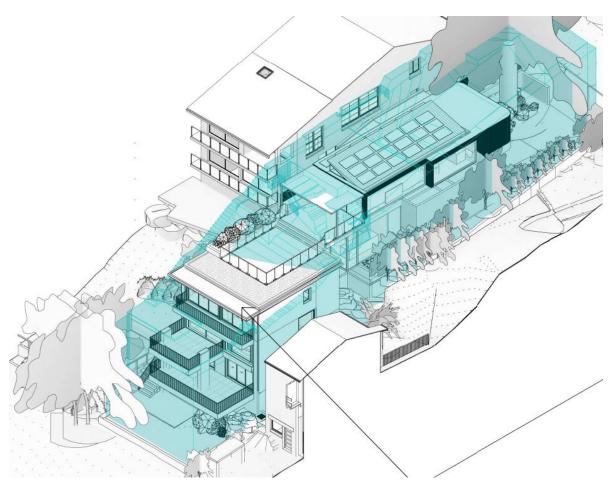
Plan extract showing 8.5 metre building height breaching elements
